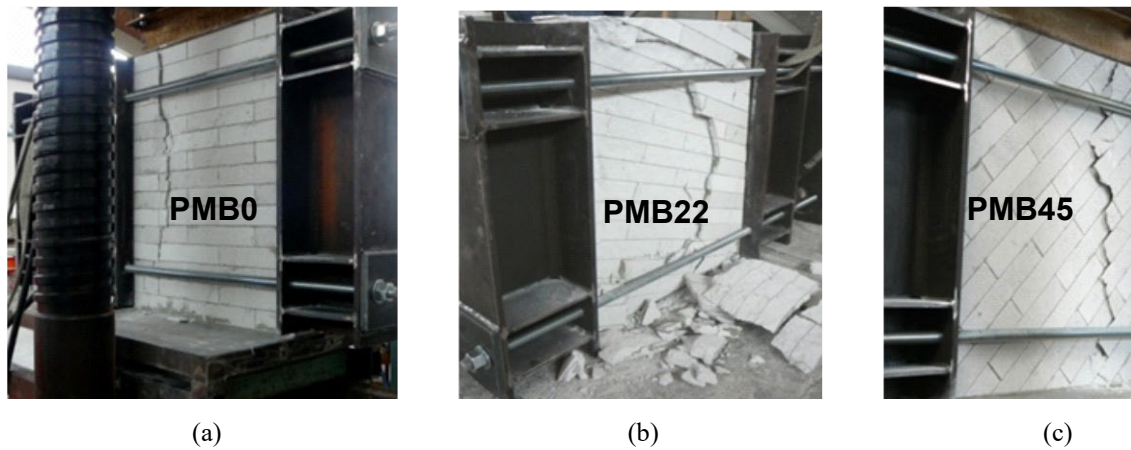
Biaxial compression tests on AAC masonry panels (PMB): observed crack patterns at failure as function of bed joint inclination.
